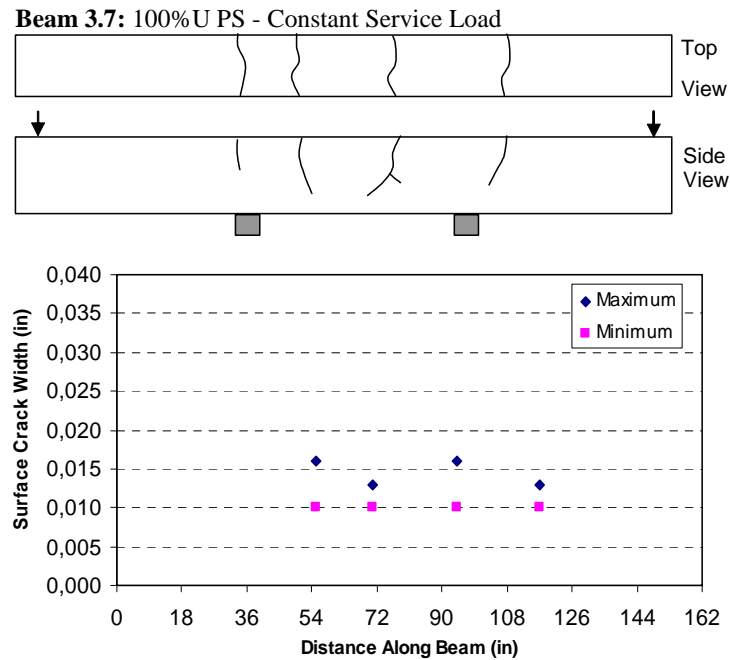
Non-PS Section – Crack Patterns and Measurements<sup>7</sup>
